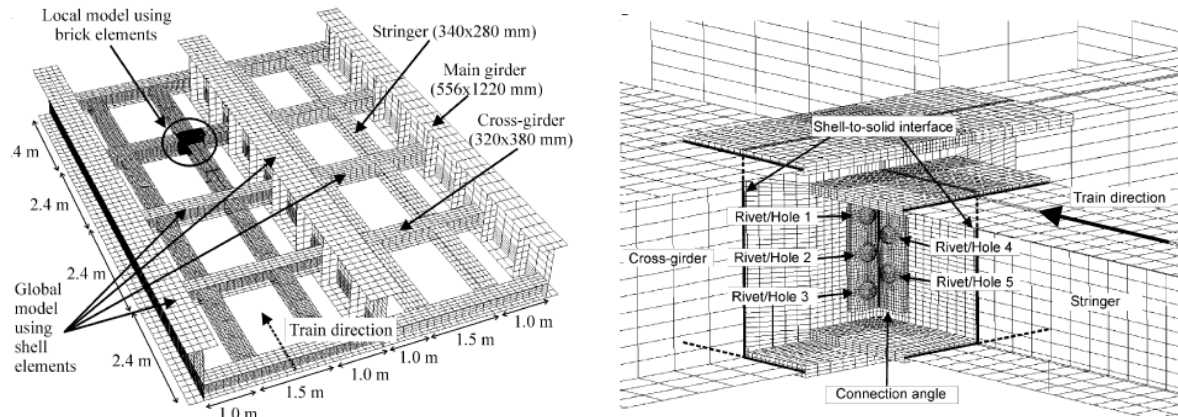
Numerical model of riveted connection of stringer to crossbeam [36]
